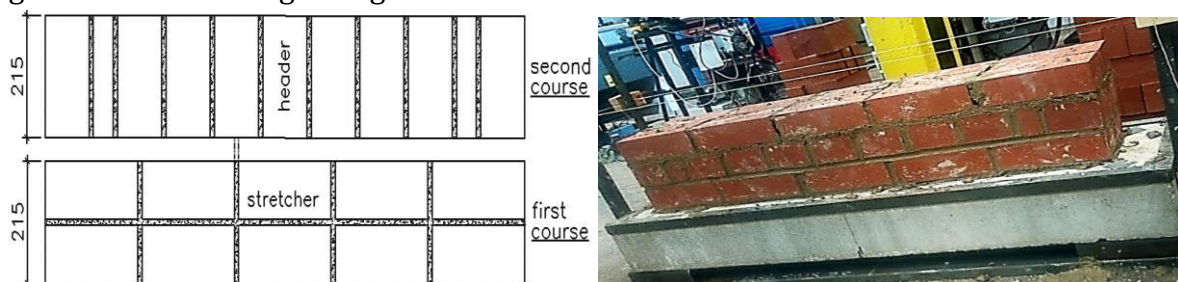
Wall specimen bonding pattern (a) plan drawing, (b) image during construction
